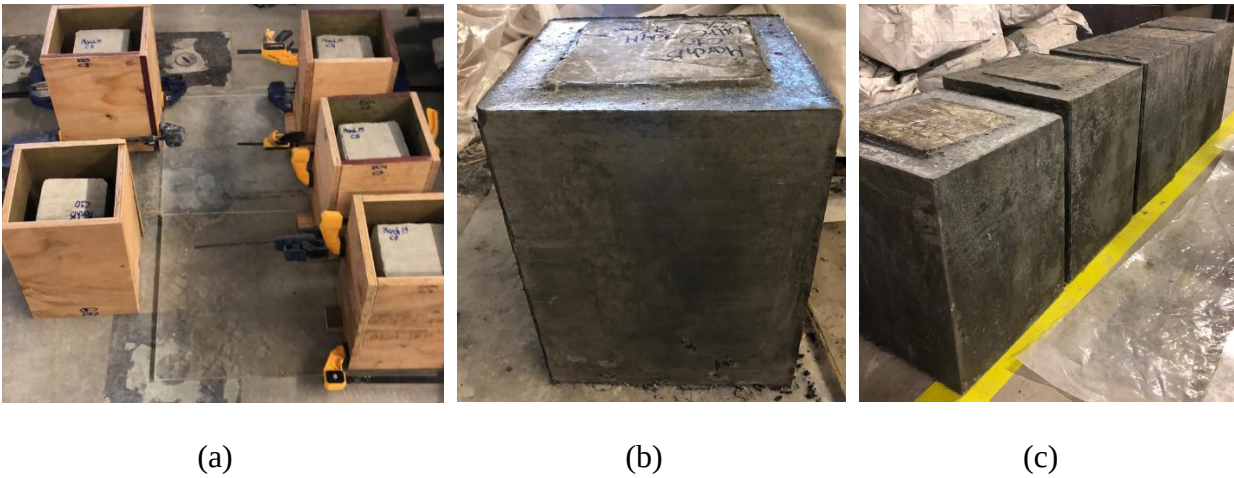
Final Retrofitted Columns with Cast-in-Place UHPFRC Jacket (a) fabrication and (b) & (c) specimens prior to painting.
